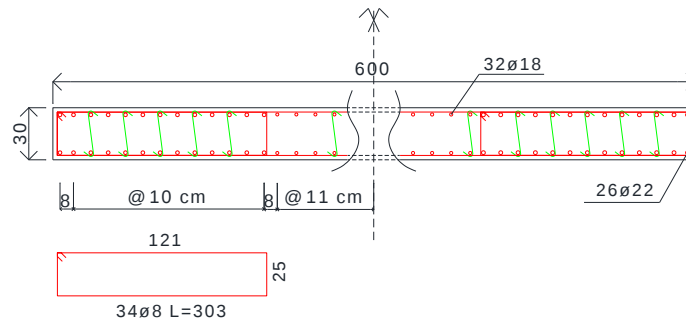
Reinforcement details of ground floor shear wall section.
